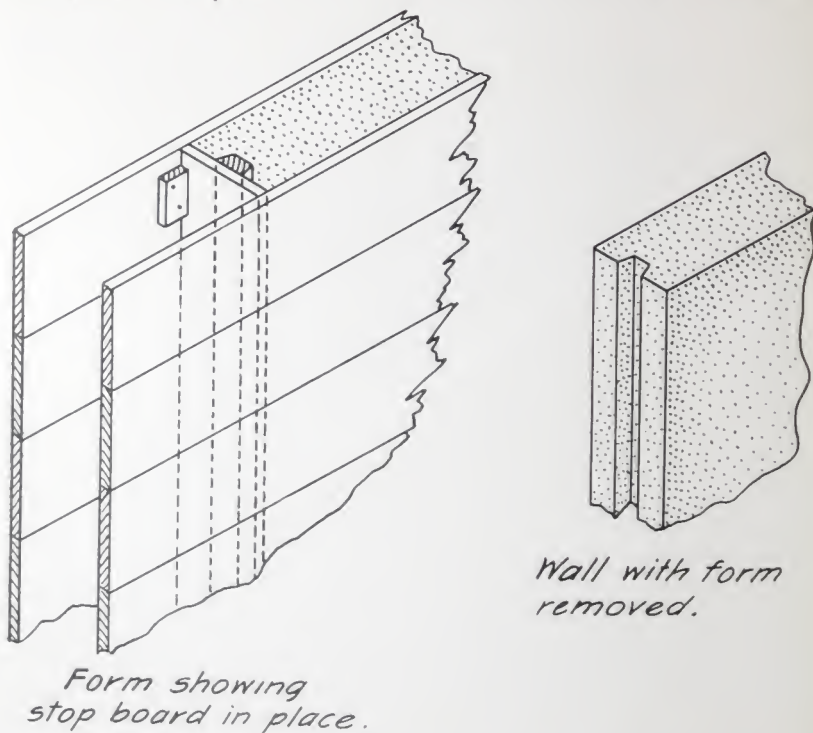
Method of making a vertical joint in a concrete foundation when necessary or desirable to finish concreting in a section up to the entire height of forms.
